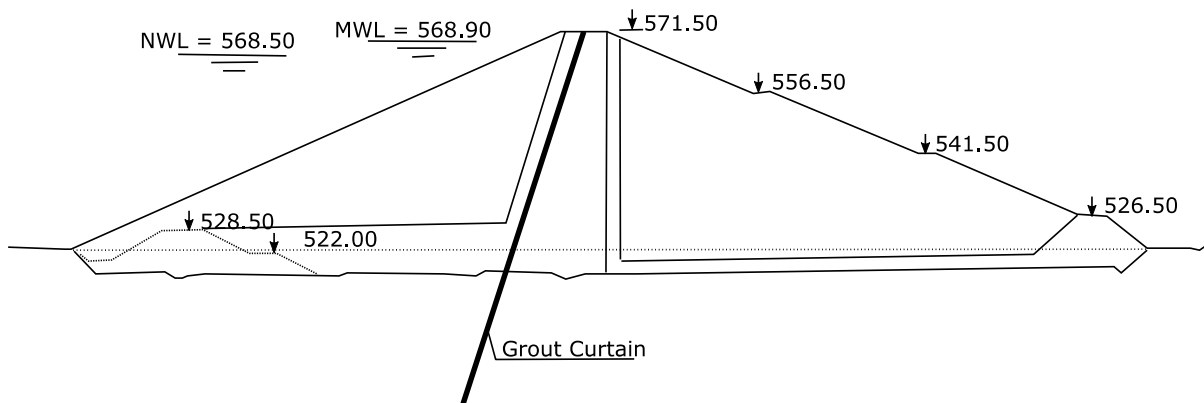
Cross-section of Meimoa dam (Caldeira & Brito, 2014)
